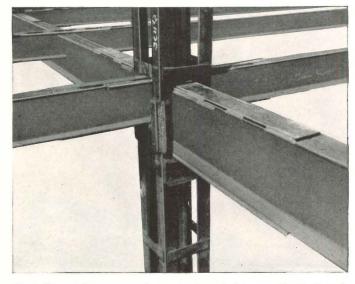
Main girders, supported on cross channel plates, run directly through main columns. Four column angle sections shown are for temporary support during erection and later serve for composite steel and concrete columns. This construction is used on a Los Angeles Bell Telephone Building extension.
